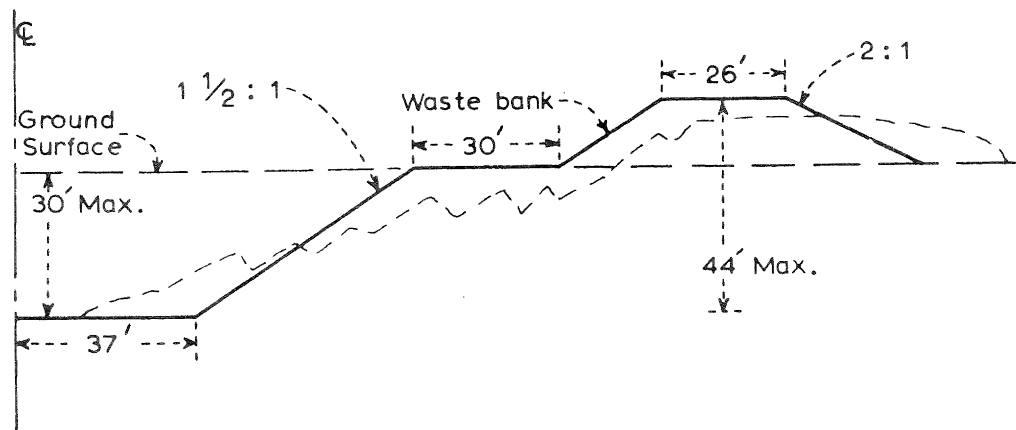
BANK FAILURE -- ALL AMERICAN CANAL
